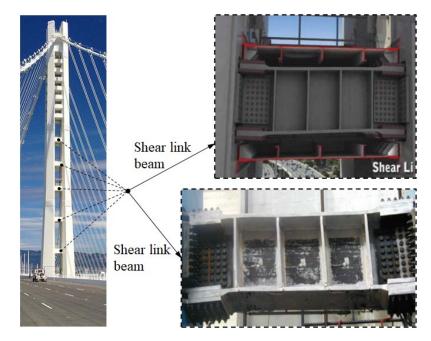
Tower shear link beams of the Oakland Bay Bridge.
